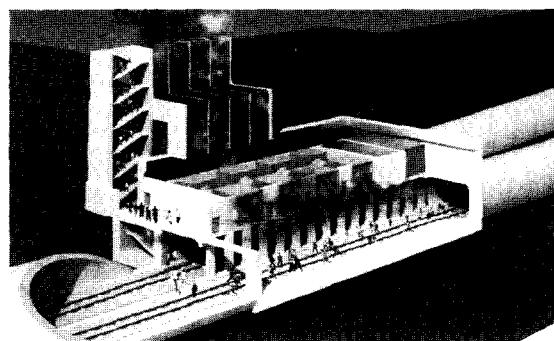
Alternative drawing showing egress only stair attached in air tower (people for stair, smoke for air tower)
